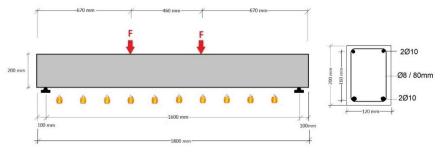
Considered beam with its geometry, cross-section and loading conditions.
